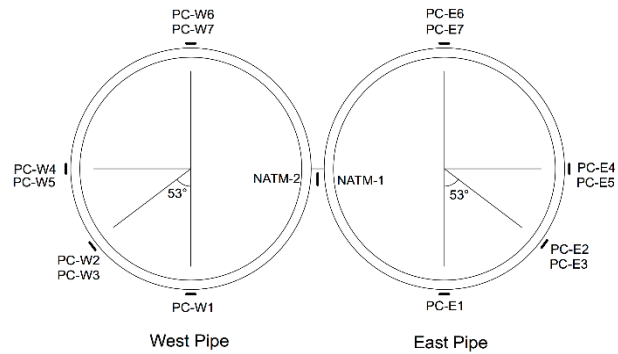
Placement of the earth pressure and NATM sensors around the culverts.
